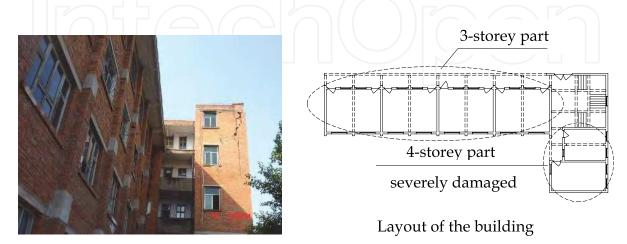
Severe damage of masonry buildings with plan irregularity
